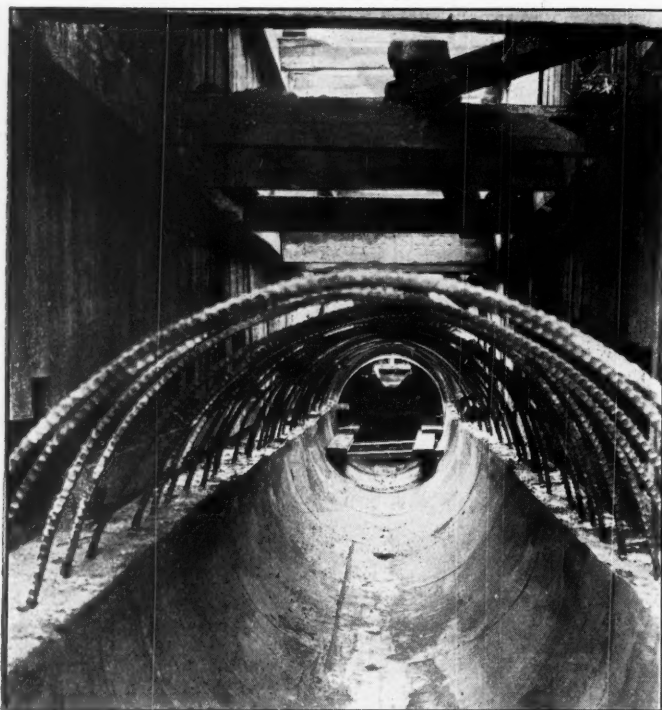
MYRTLE AVENUE TRUNK SEWER
